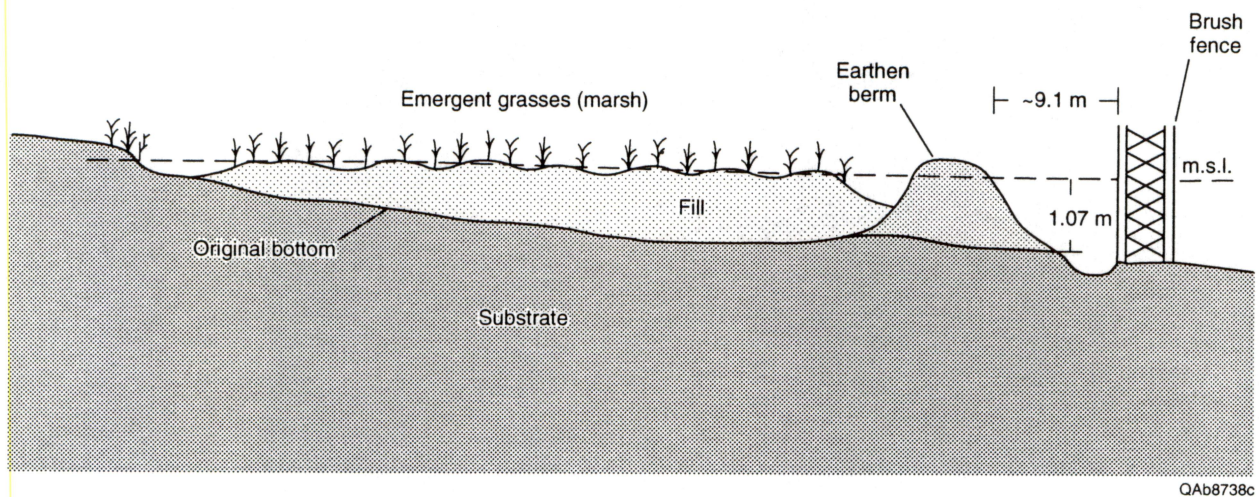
General cross section of the Armand Bayou marsh site showing approximate thickness of fill, earthen berm, and brush fence. From Galveston Bay Foundation.
